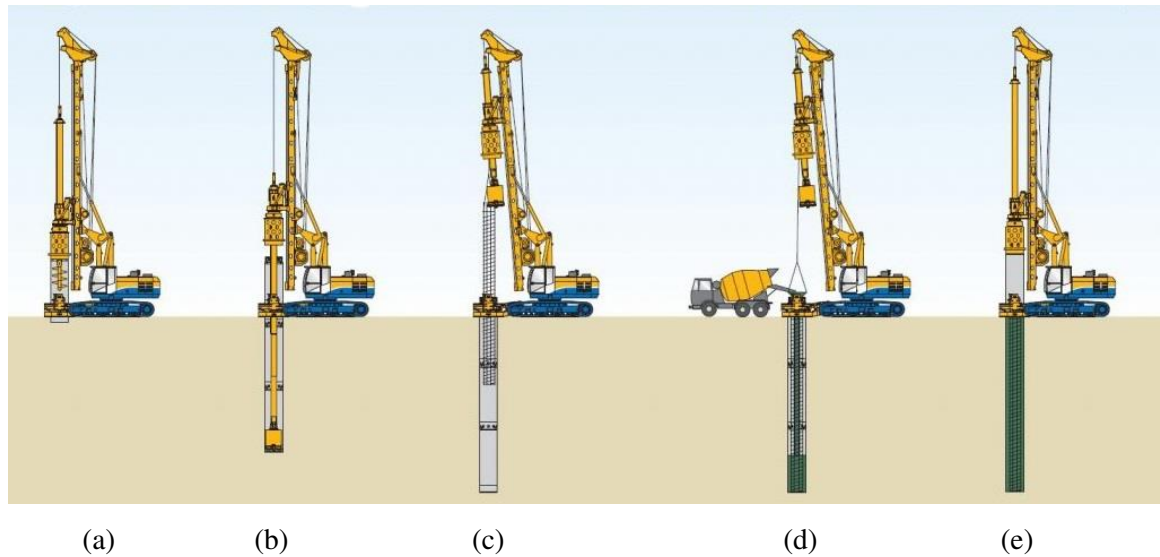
Installation of Driven Piles step by step, (a) casing installation, (b) drilling, (c) installation reinforcement, (d) pouring concrete, and (e) extracting the casing [1]
